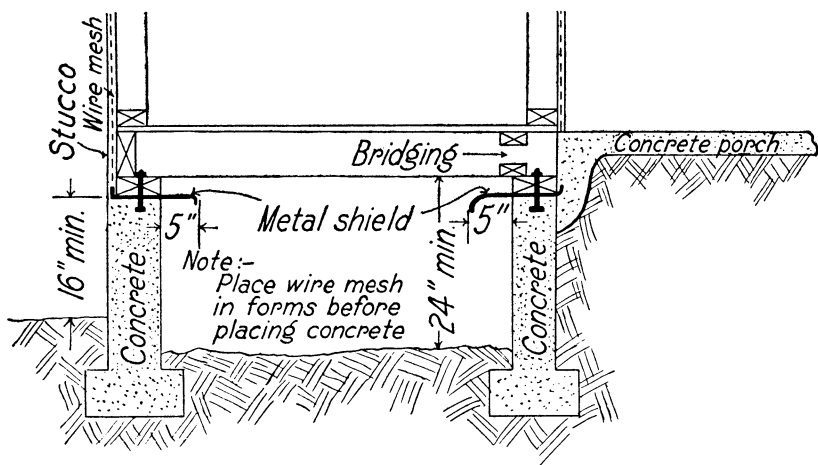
Plans for protection of stucco building against subterranean termites. Modified from plans issued by Mr. Walter Putnam, city superintendent of buildings, Pasadena, California. The chief modification is in ending the stucco at the upper level of the concrete foundation. The color scheme may be preserved by a wash on the foundation surface to correspond with the stucco.
